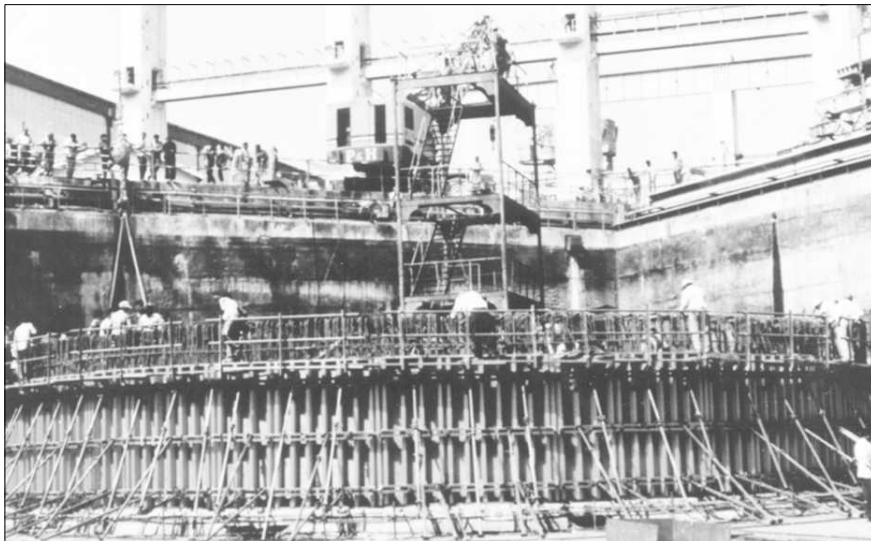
Shoe of Caisson for Intake Structure Being Cast in the Dry Dock, Visakhapatnam.
